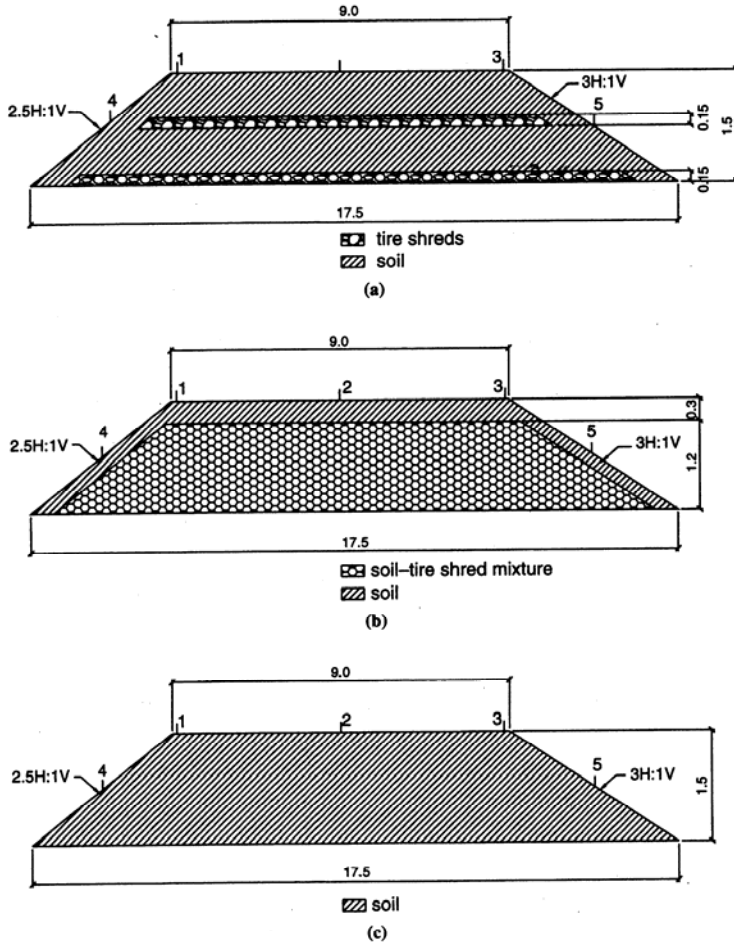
Prototype embankment cross-section characteristics (dimensions in meters): (a) Section A, (b) Section B, (c) Section C (H = horizontal, V = vertical).
